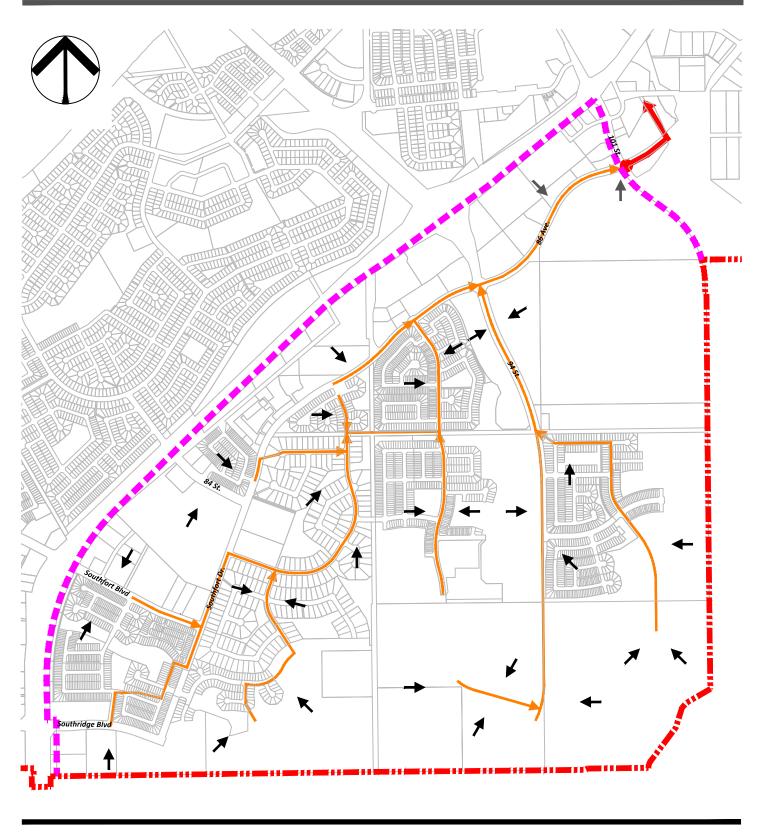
Sanitary Servicing Plan *City of Fort Saskatchewan Southfort Area Structure Plan
